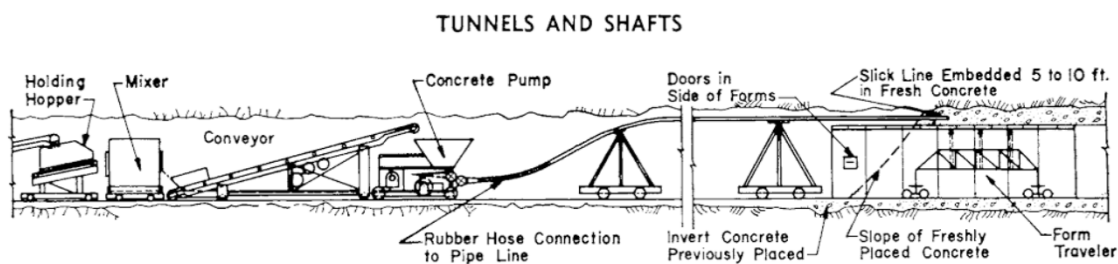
Arrangement of equipment for arch concreting within the tunnel.
